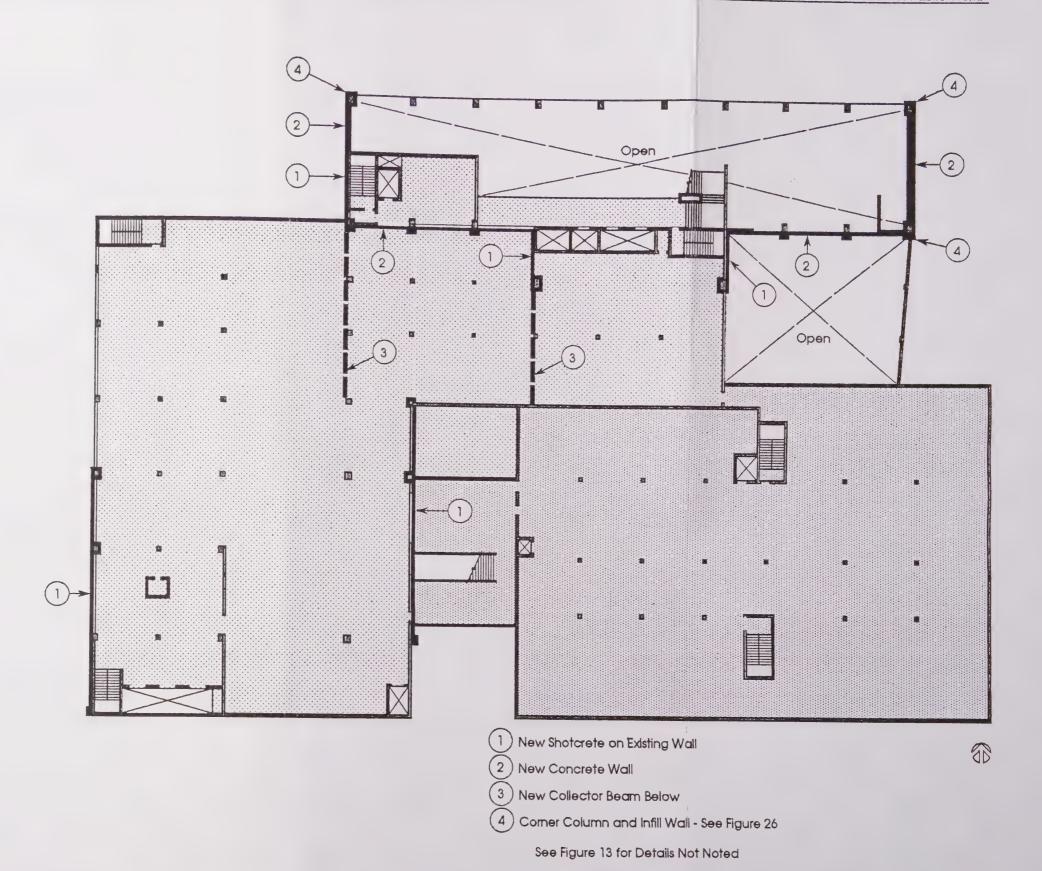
Retrofit Scheme - 2nd Floor Plan
